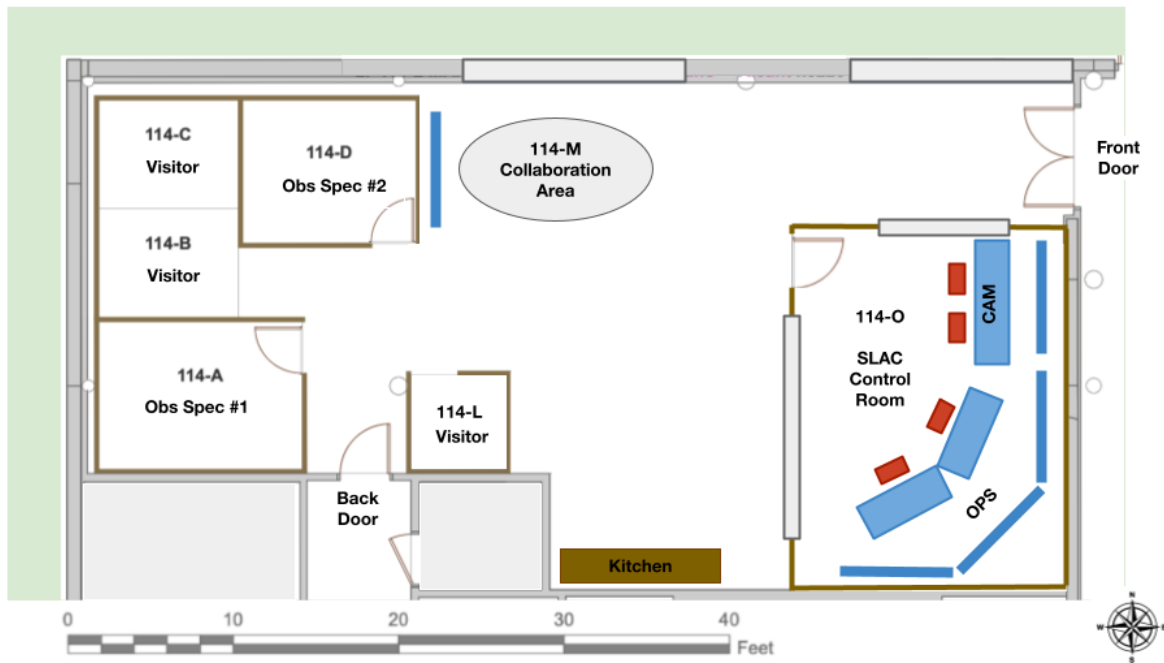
Alternate design. This floorplan makes slightly less of the available space, with a longer corridor of entry from the front door, and some further loss of space from the collaboration area to the thoroughfare between the front door and the offices at the West end. If the Control Room partition walls cannot contain much glass, this layout may become the preferred one (because the other layout would block too much light from the windows to the rest of the Center.
